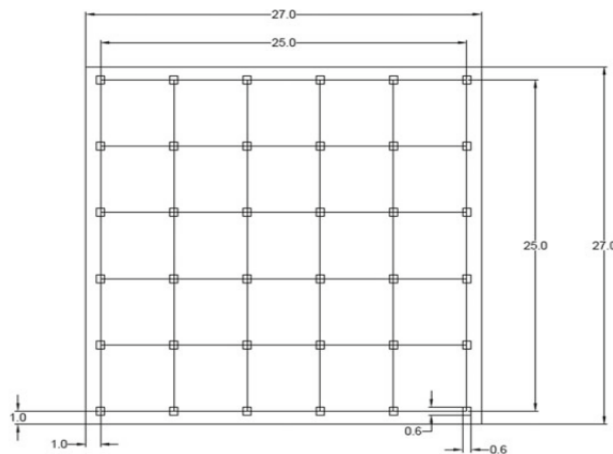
Plan dimensions of building and foundation considered in the study (in metres)
